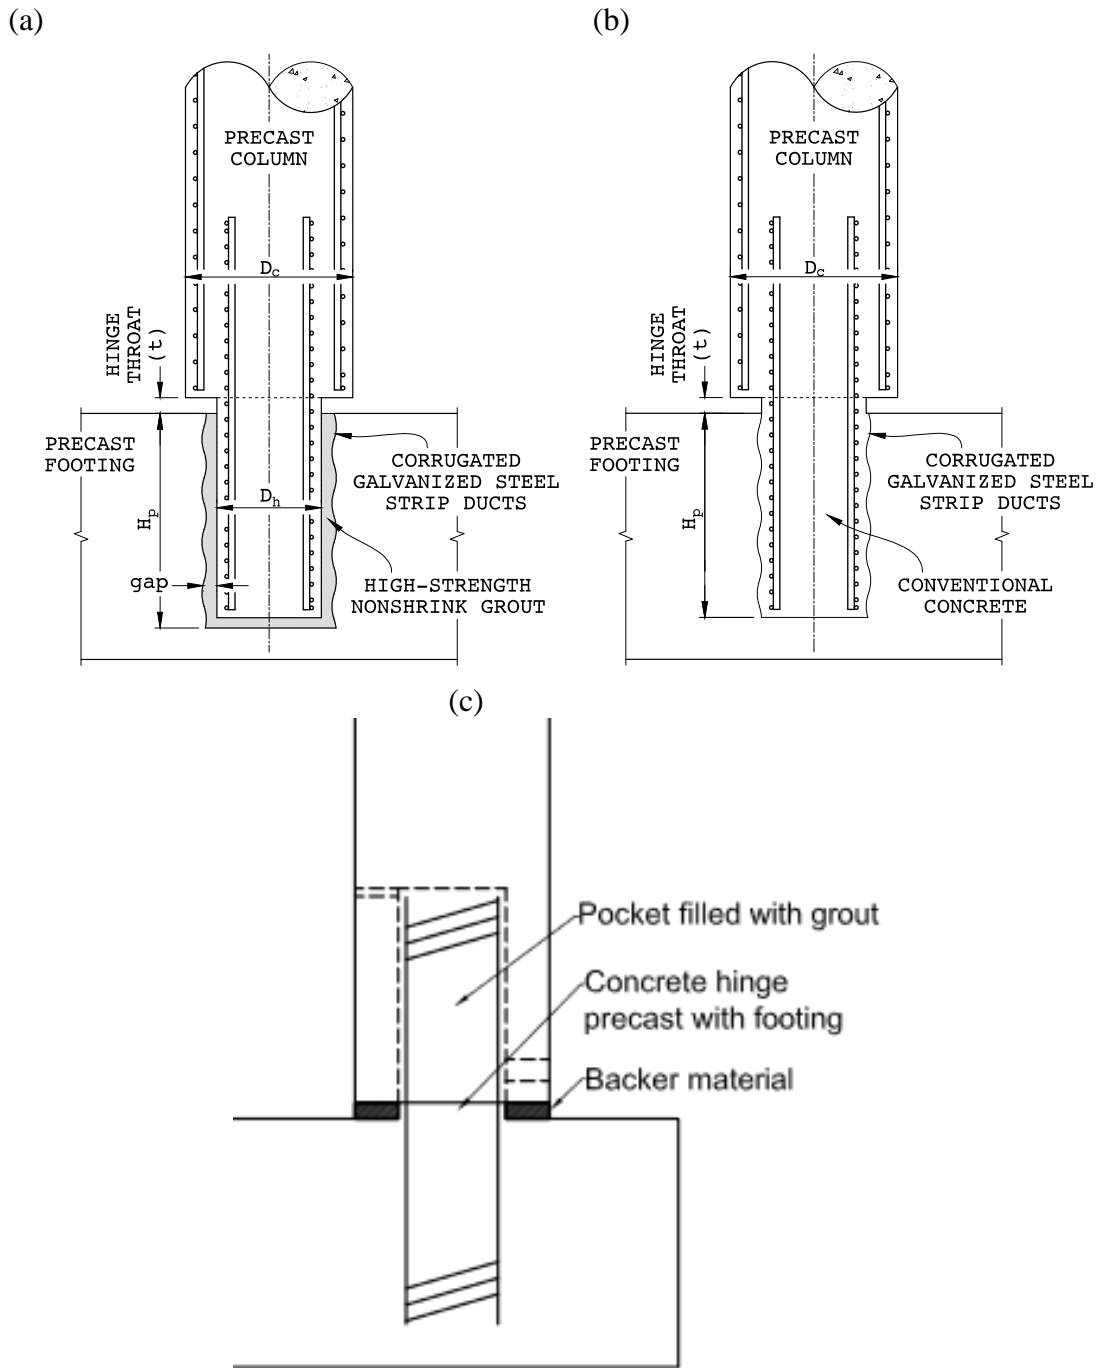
column to footing (a) rebar hinge pocket connection, (b) rebar hinge socket connection, (c) rebar hinge pocket connection with pocket left in column
